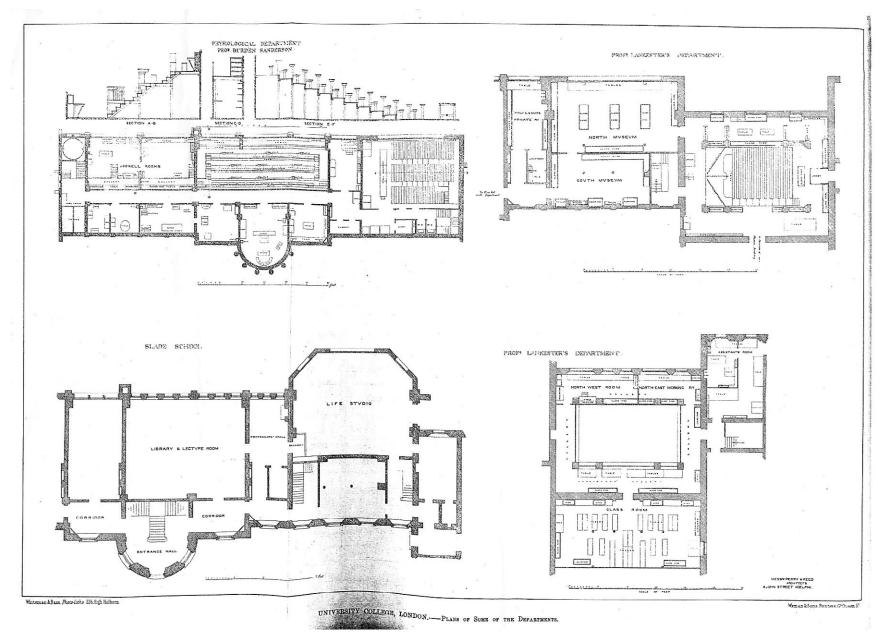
Plan of the North Wing for the Slade School of Art, designed by T. Hayter Lewis
